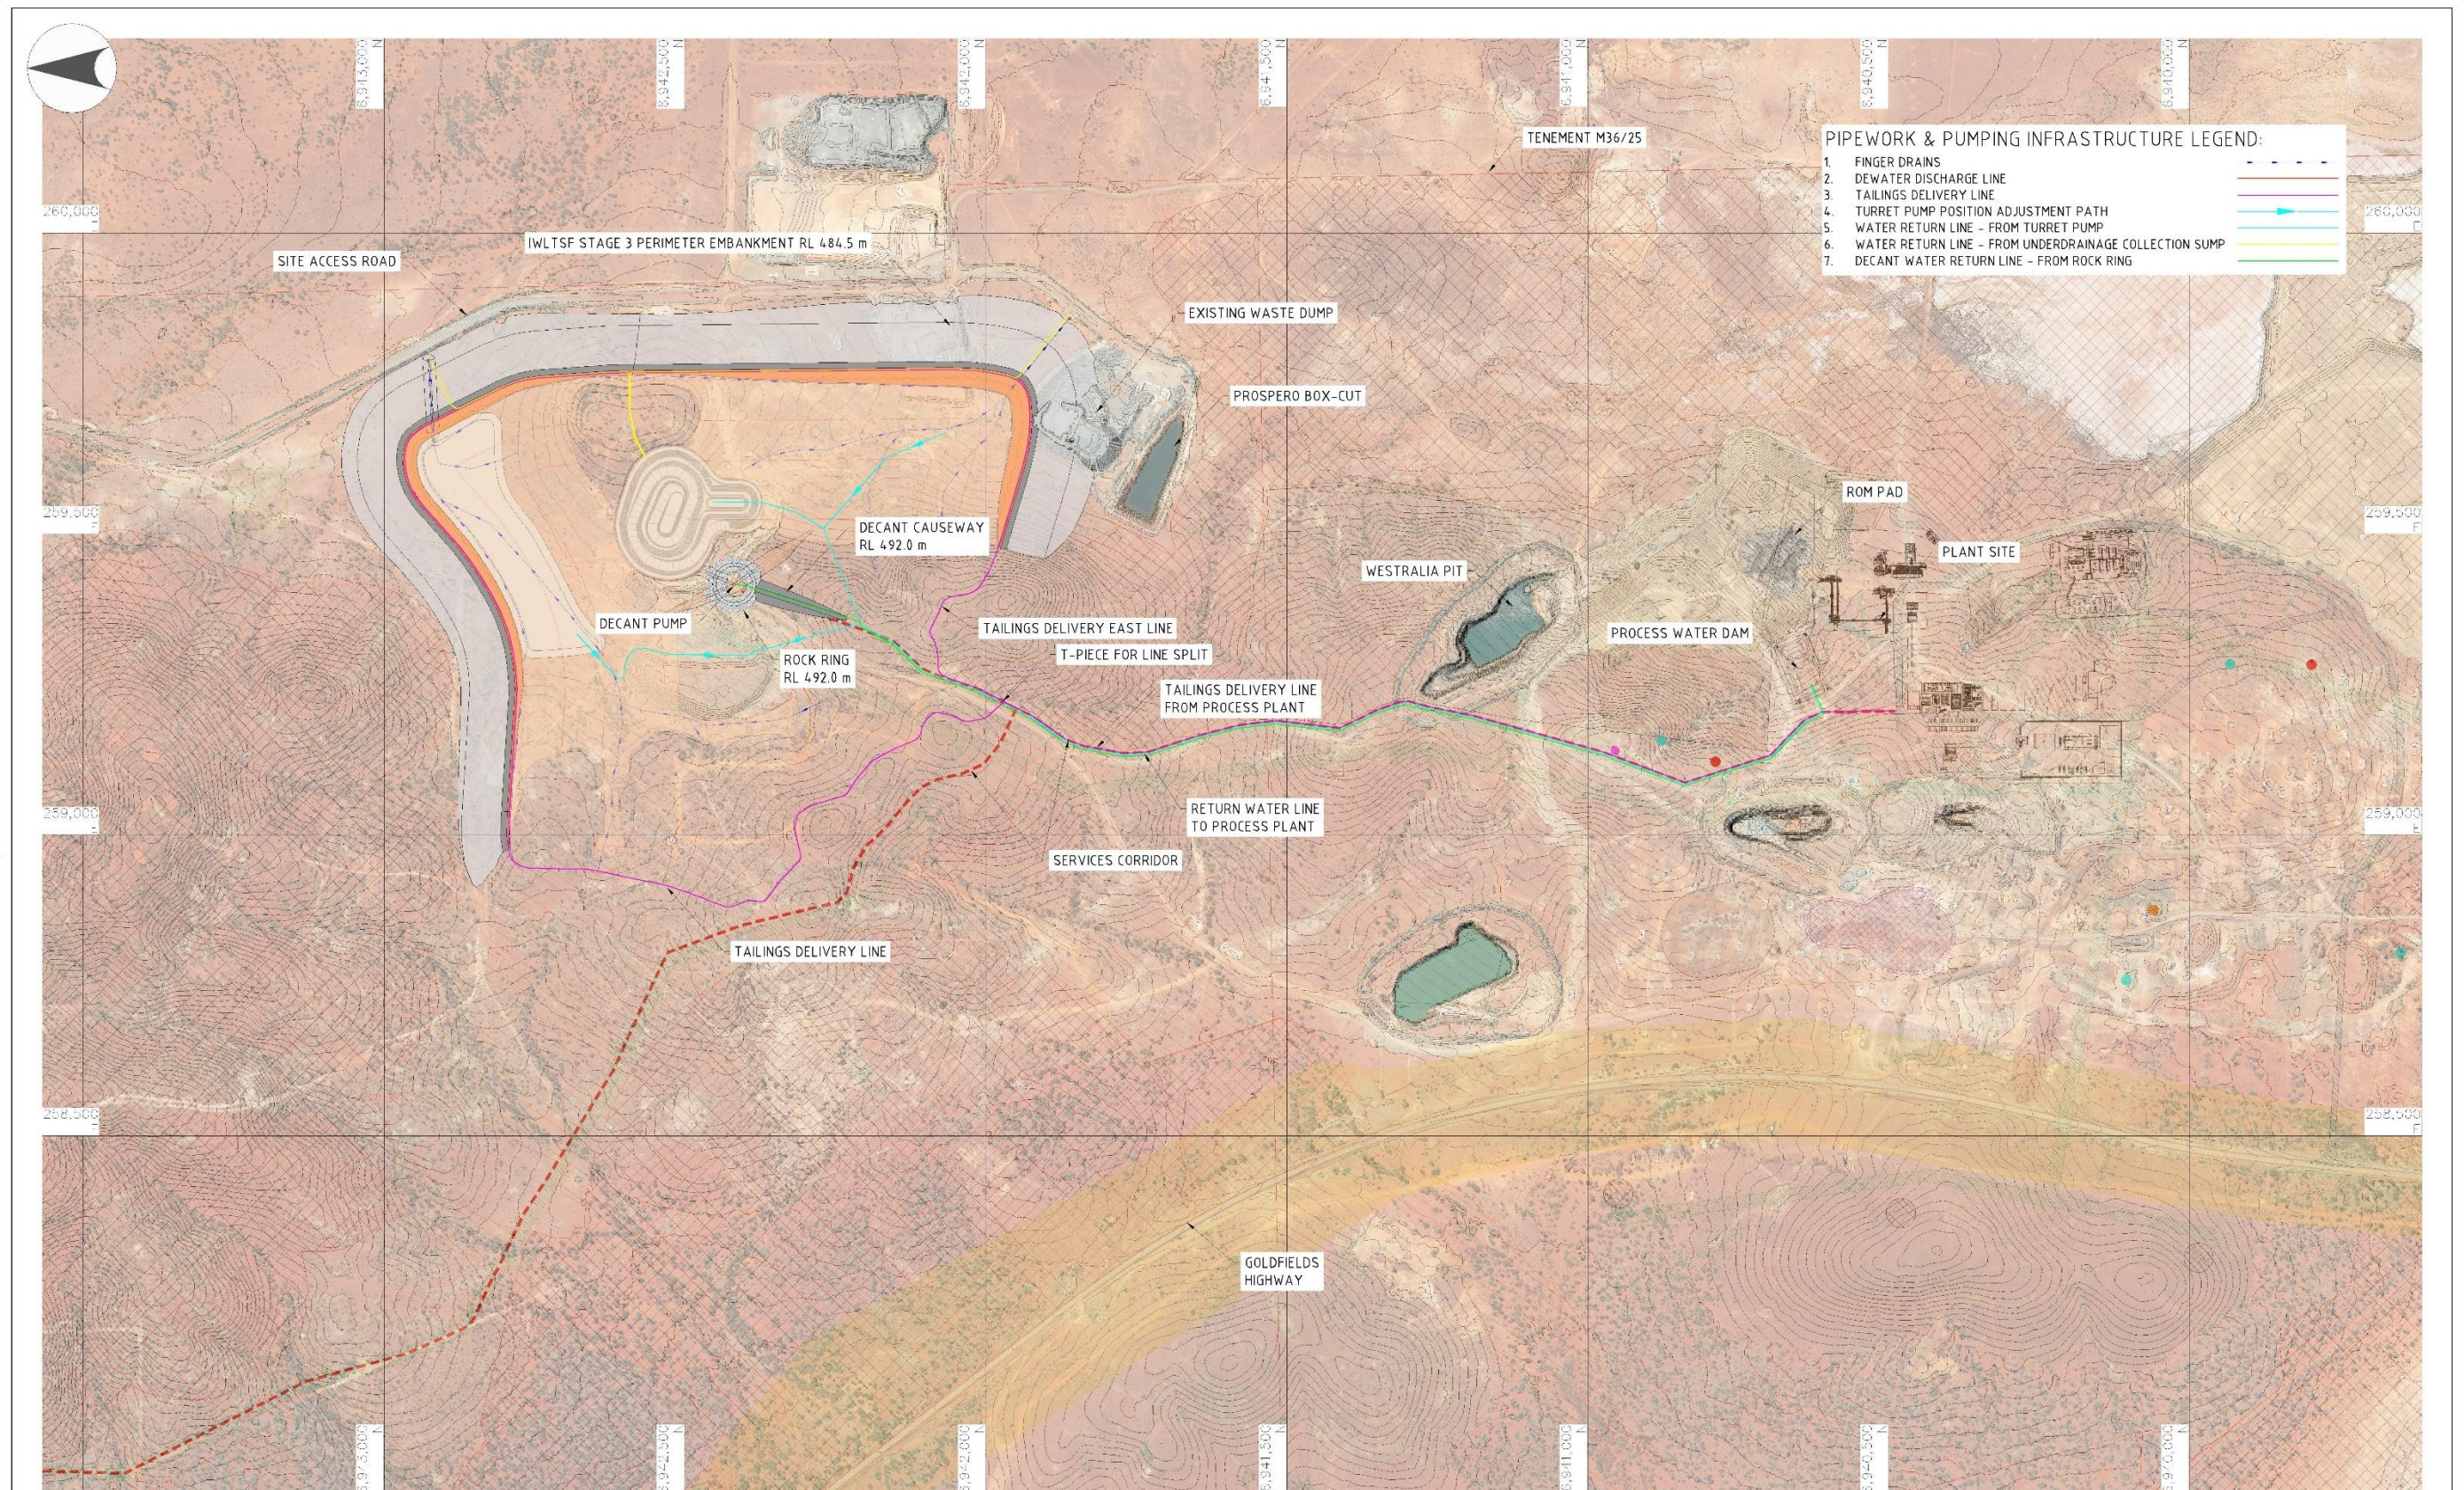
Underdrainage, pipelines, decant pump positions and final rock ring decant position for IWLTSF (Stage 3)
